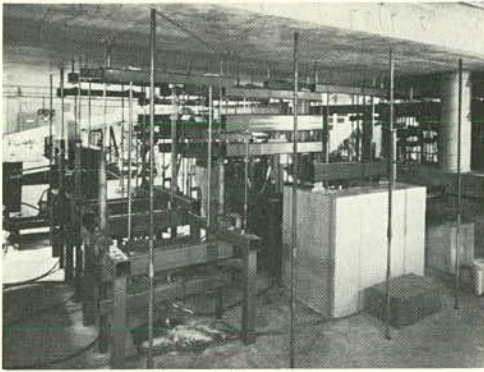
Double-Column Model Bridge Loading Apparatus
